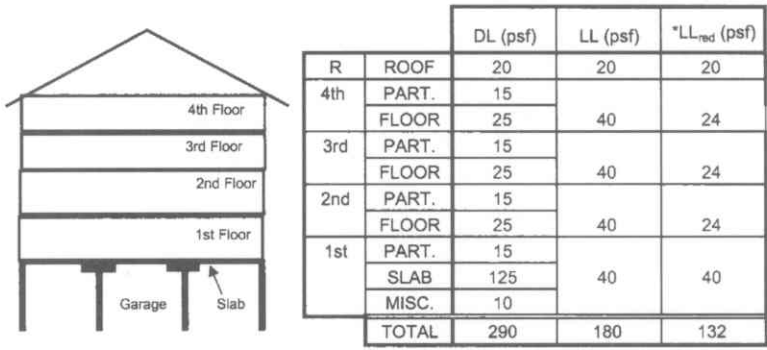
Typical Podium Slab Loading (1 psf=0.048 kN/m²)
